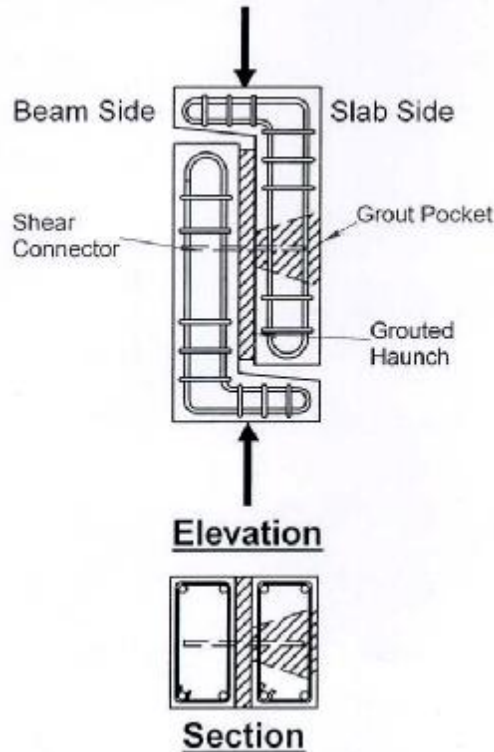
Push-off test specimen (*Menkulasi and Roberts-Wollman 2005*)
